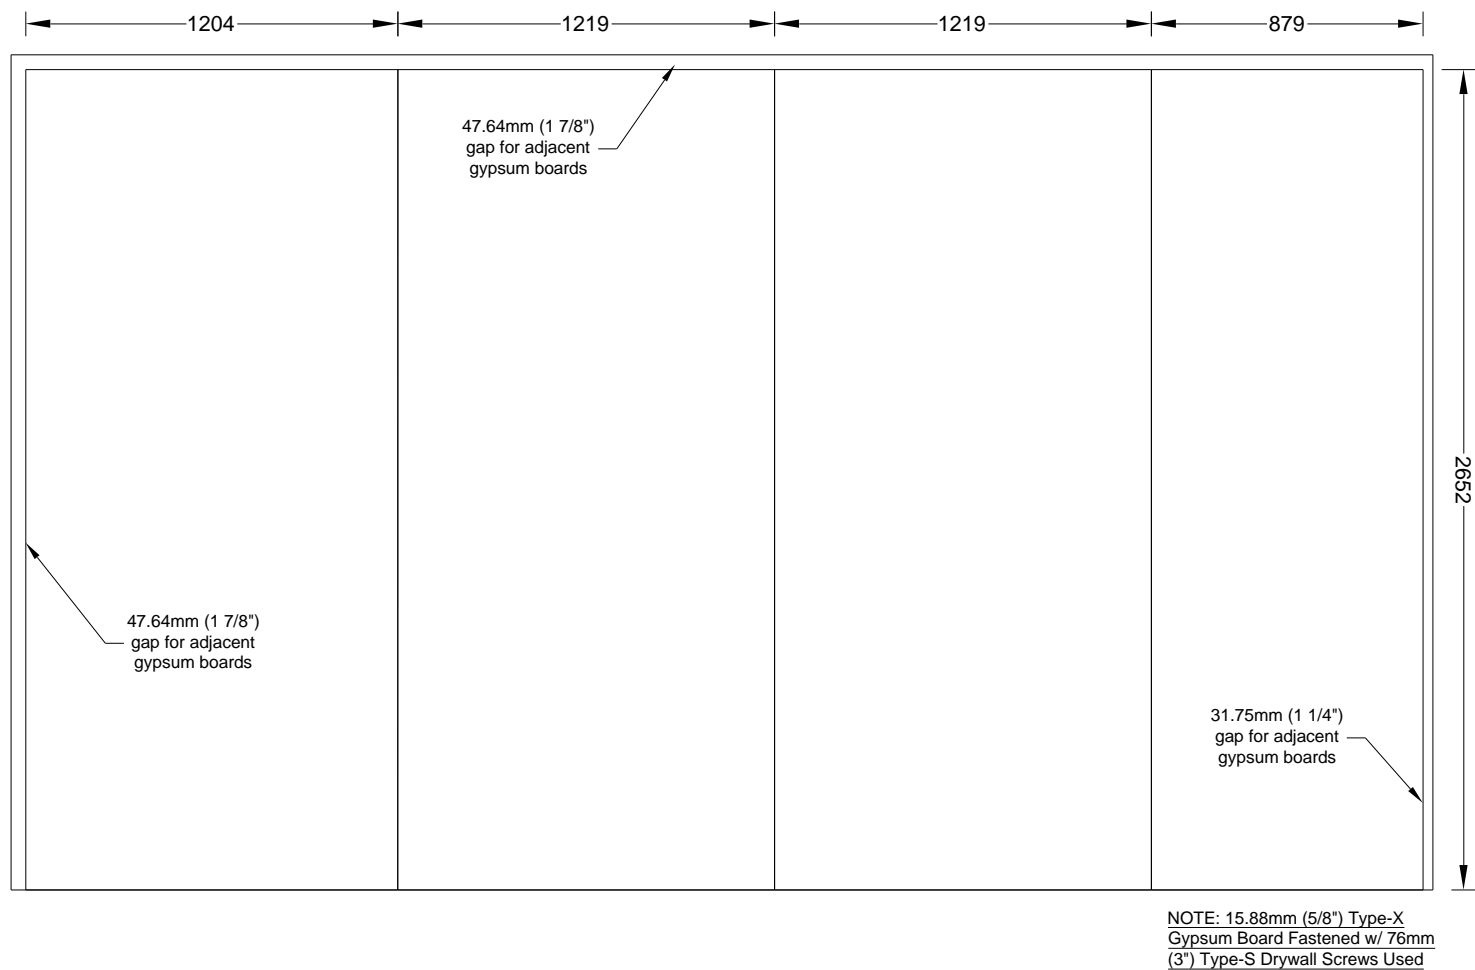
Test 1-1 Large Compartment CLT - W4 - Gypsum Layout - Base Layer
